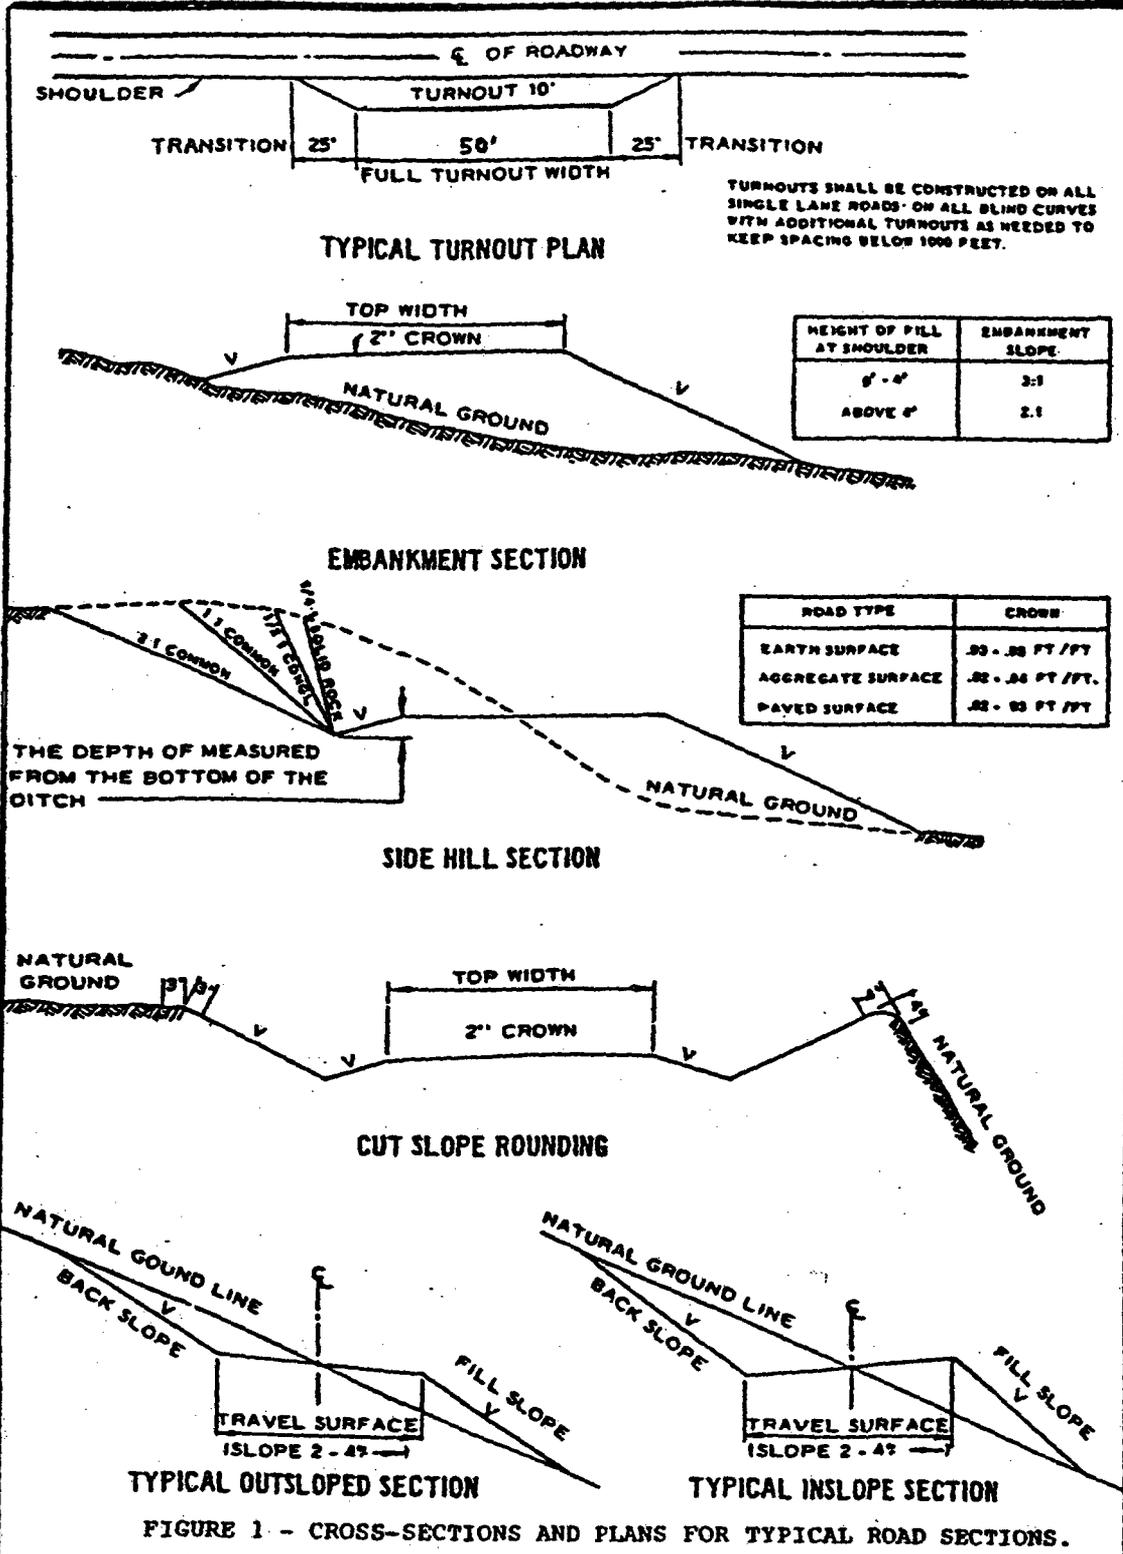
CROSS-SECTIONS AND PLANS FOR TYPICAL ROAD SECTIONS.
